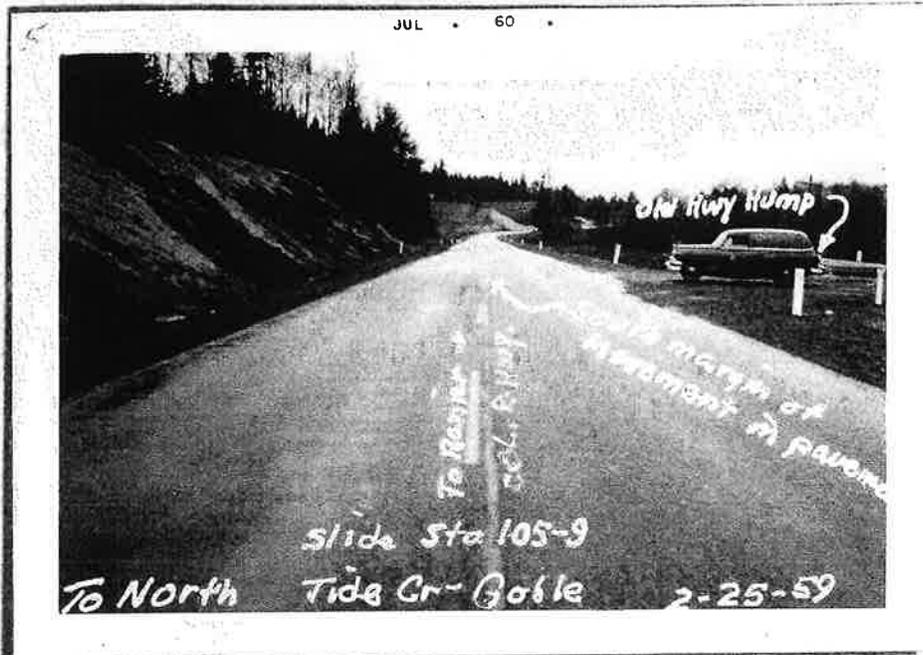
to 3 show slope failure and excess surface water and horizontal drains as corrective measure.
